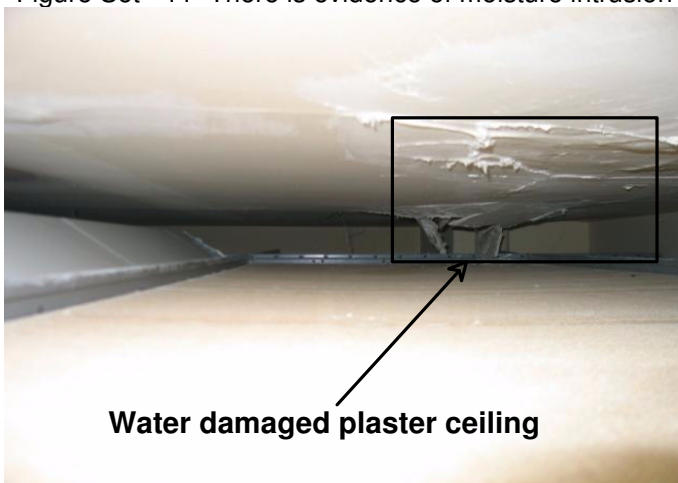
The plaster ceiling above the suspended tile ceiling is water damaged and you may wish to have evaluated
